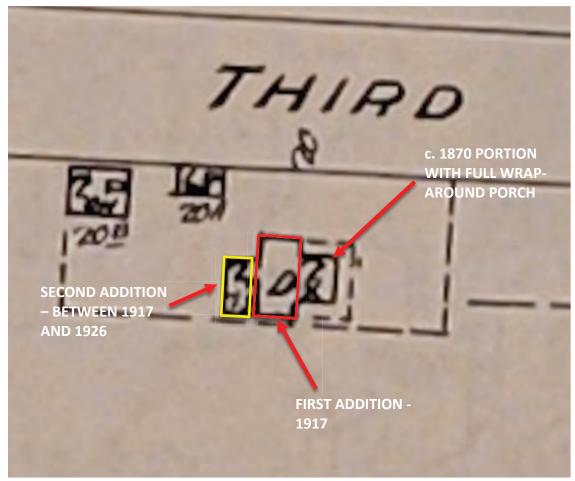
1926 Fire Insurance Plan showing the house and its two pre-1926 additions ⁶
